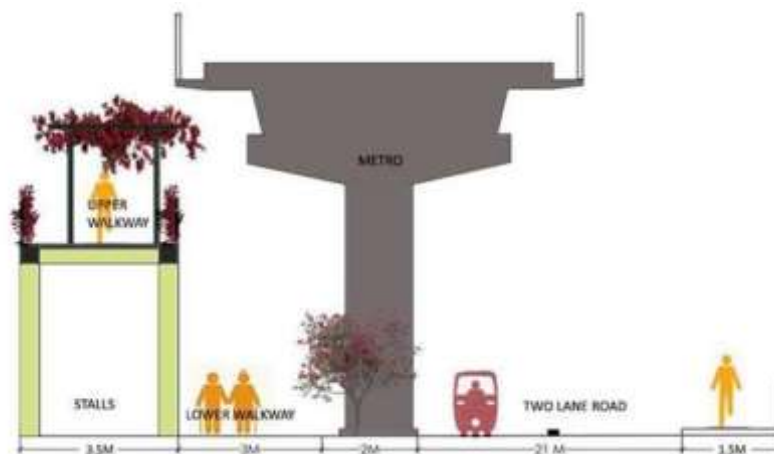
M.G.Road Boulevard sectional view (Source :Author)
